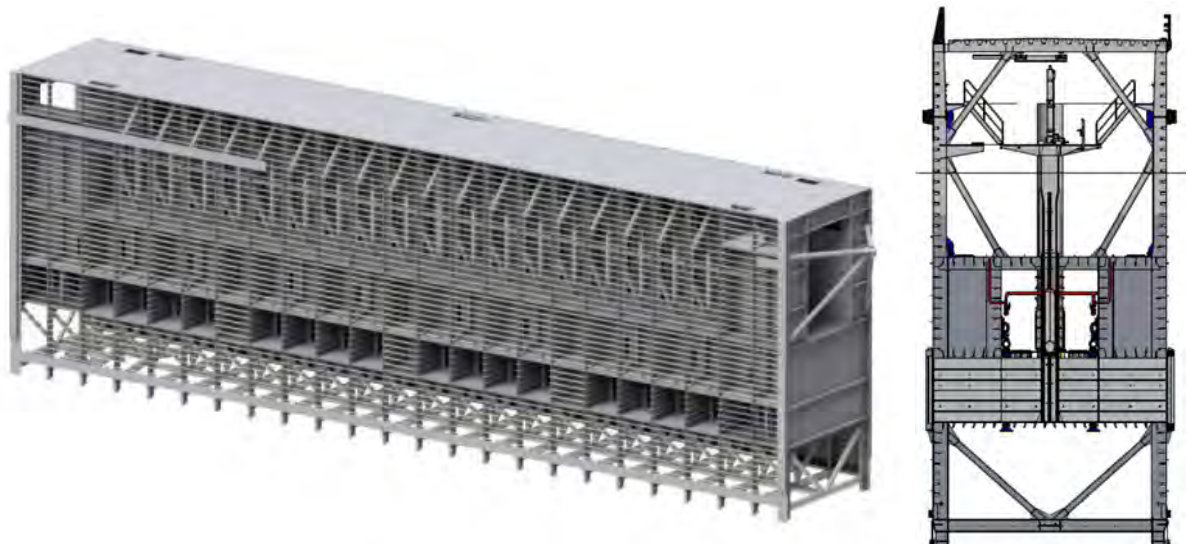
Gate steel structure (stripped outer sheeting) and cross section
